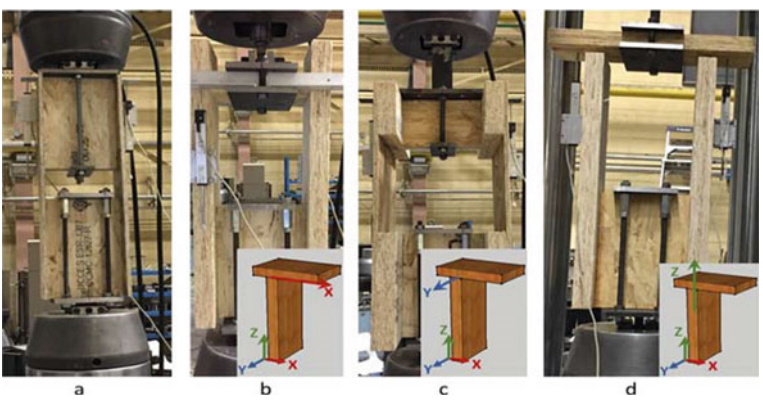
Nail connection testing a nail connection OSB-to-LSL stud (type-a), b LSL to plate-to-LSL stud along the x-direction (type-b), c LSL to plate-to-LSL stud along the y-direction (type-c), and d Nail withdrawal (type-d)
